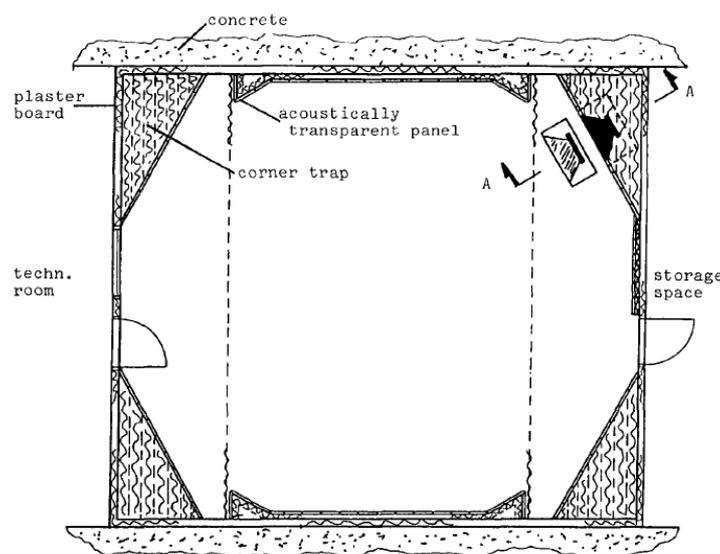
The floor plan of the FBC room with corner traps [3]
